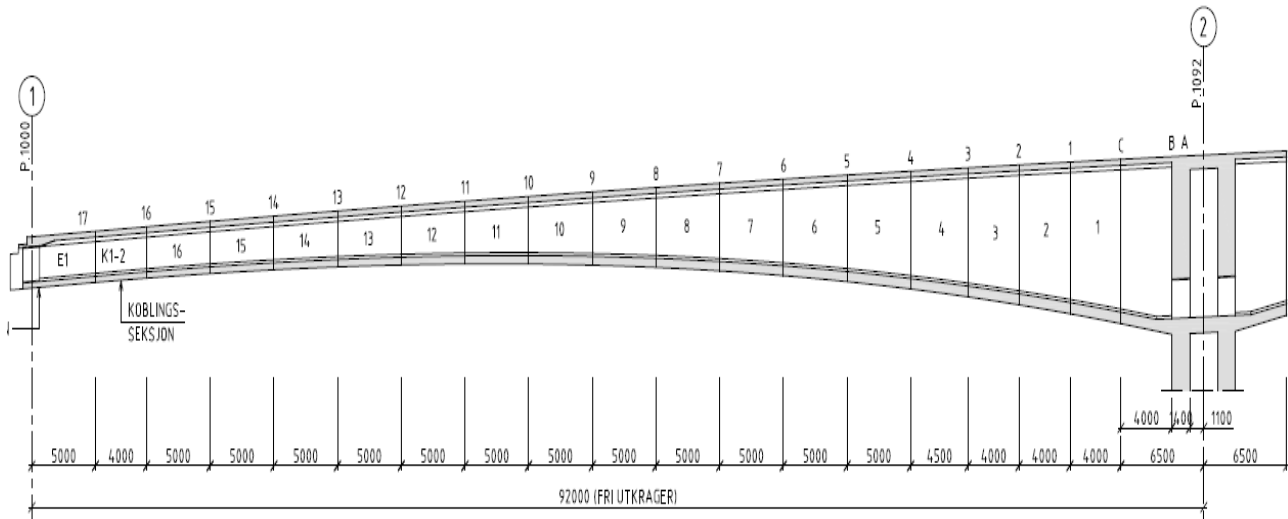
Tverlandsbrua: cantilevered construction of span 1 (starting from part 1). [7]
